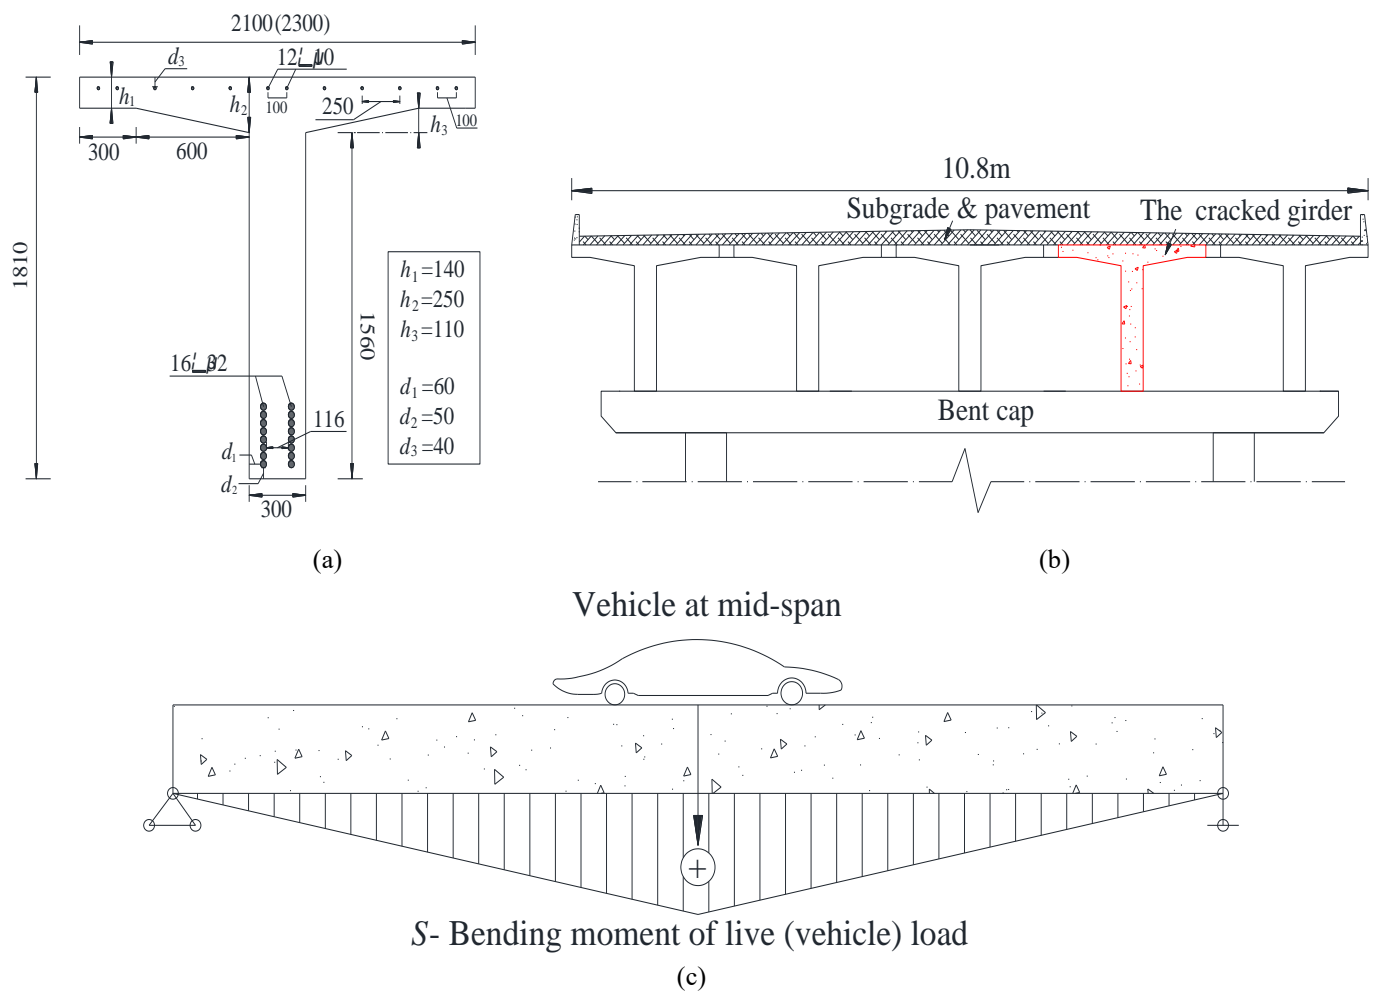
Diagram of the bridge and mode of load effects (a) girder dimension; (b) cross-section and the cracked girder; (c) mode of vehicle load.
